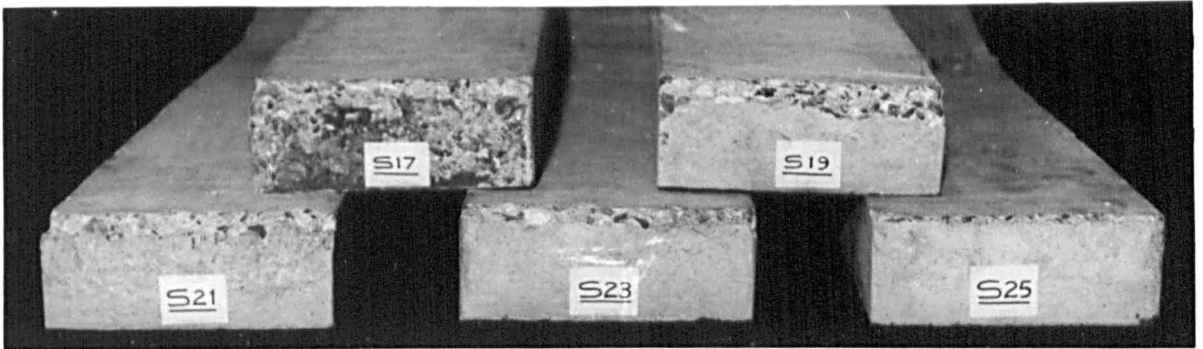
Compression Zones at the Ends of the Slab Strips of Series II After Test
